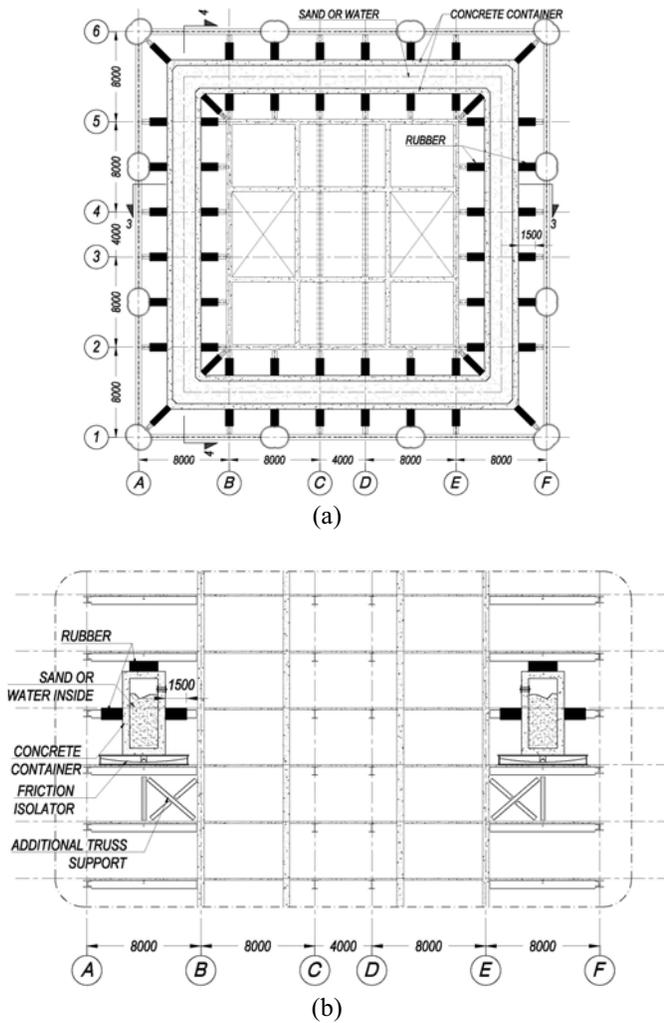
Second TMD unit: (a) plan view at story 33, (b) cross section 3-3. All dimensions are in mm.
